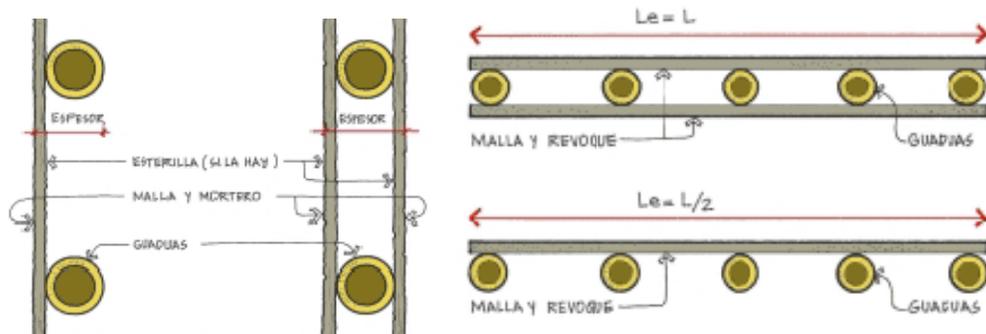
Composite wall system with bamboo as internal structure recommended spacing (AIS,2001).
